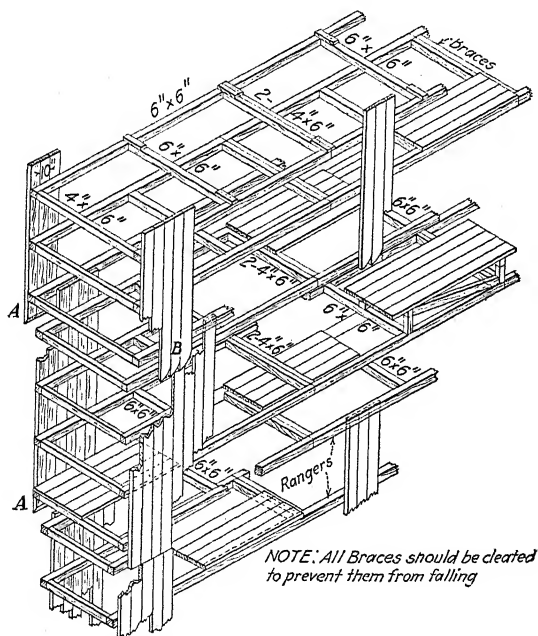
Isometric sketch of typical vertical sheet piling.
